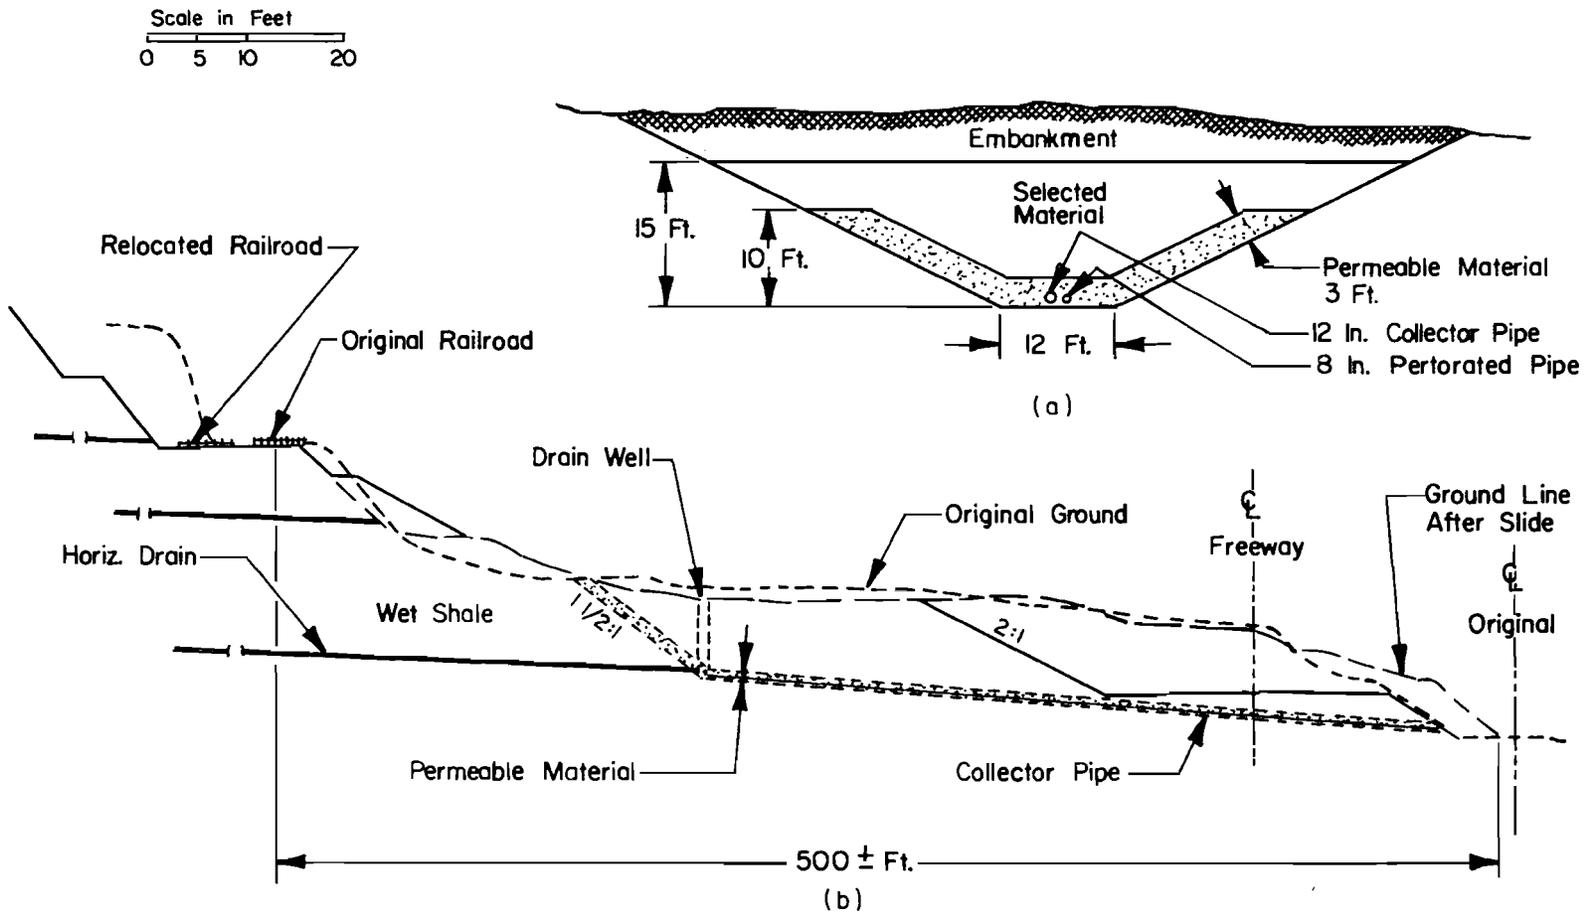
Transverse stabilization trenches - Towle slide (Cedergren, 1962).
